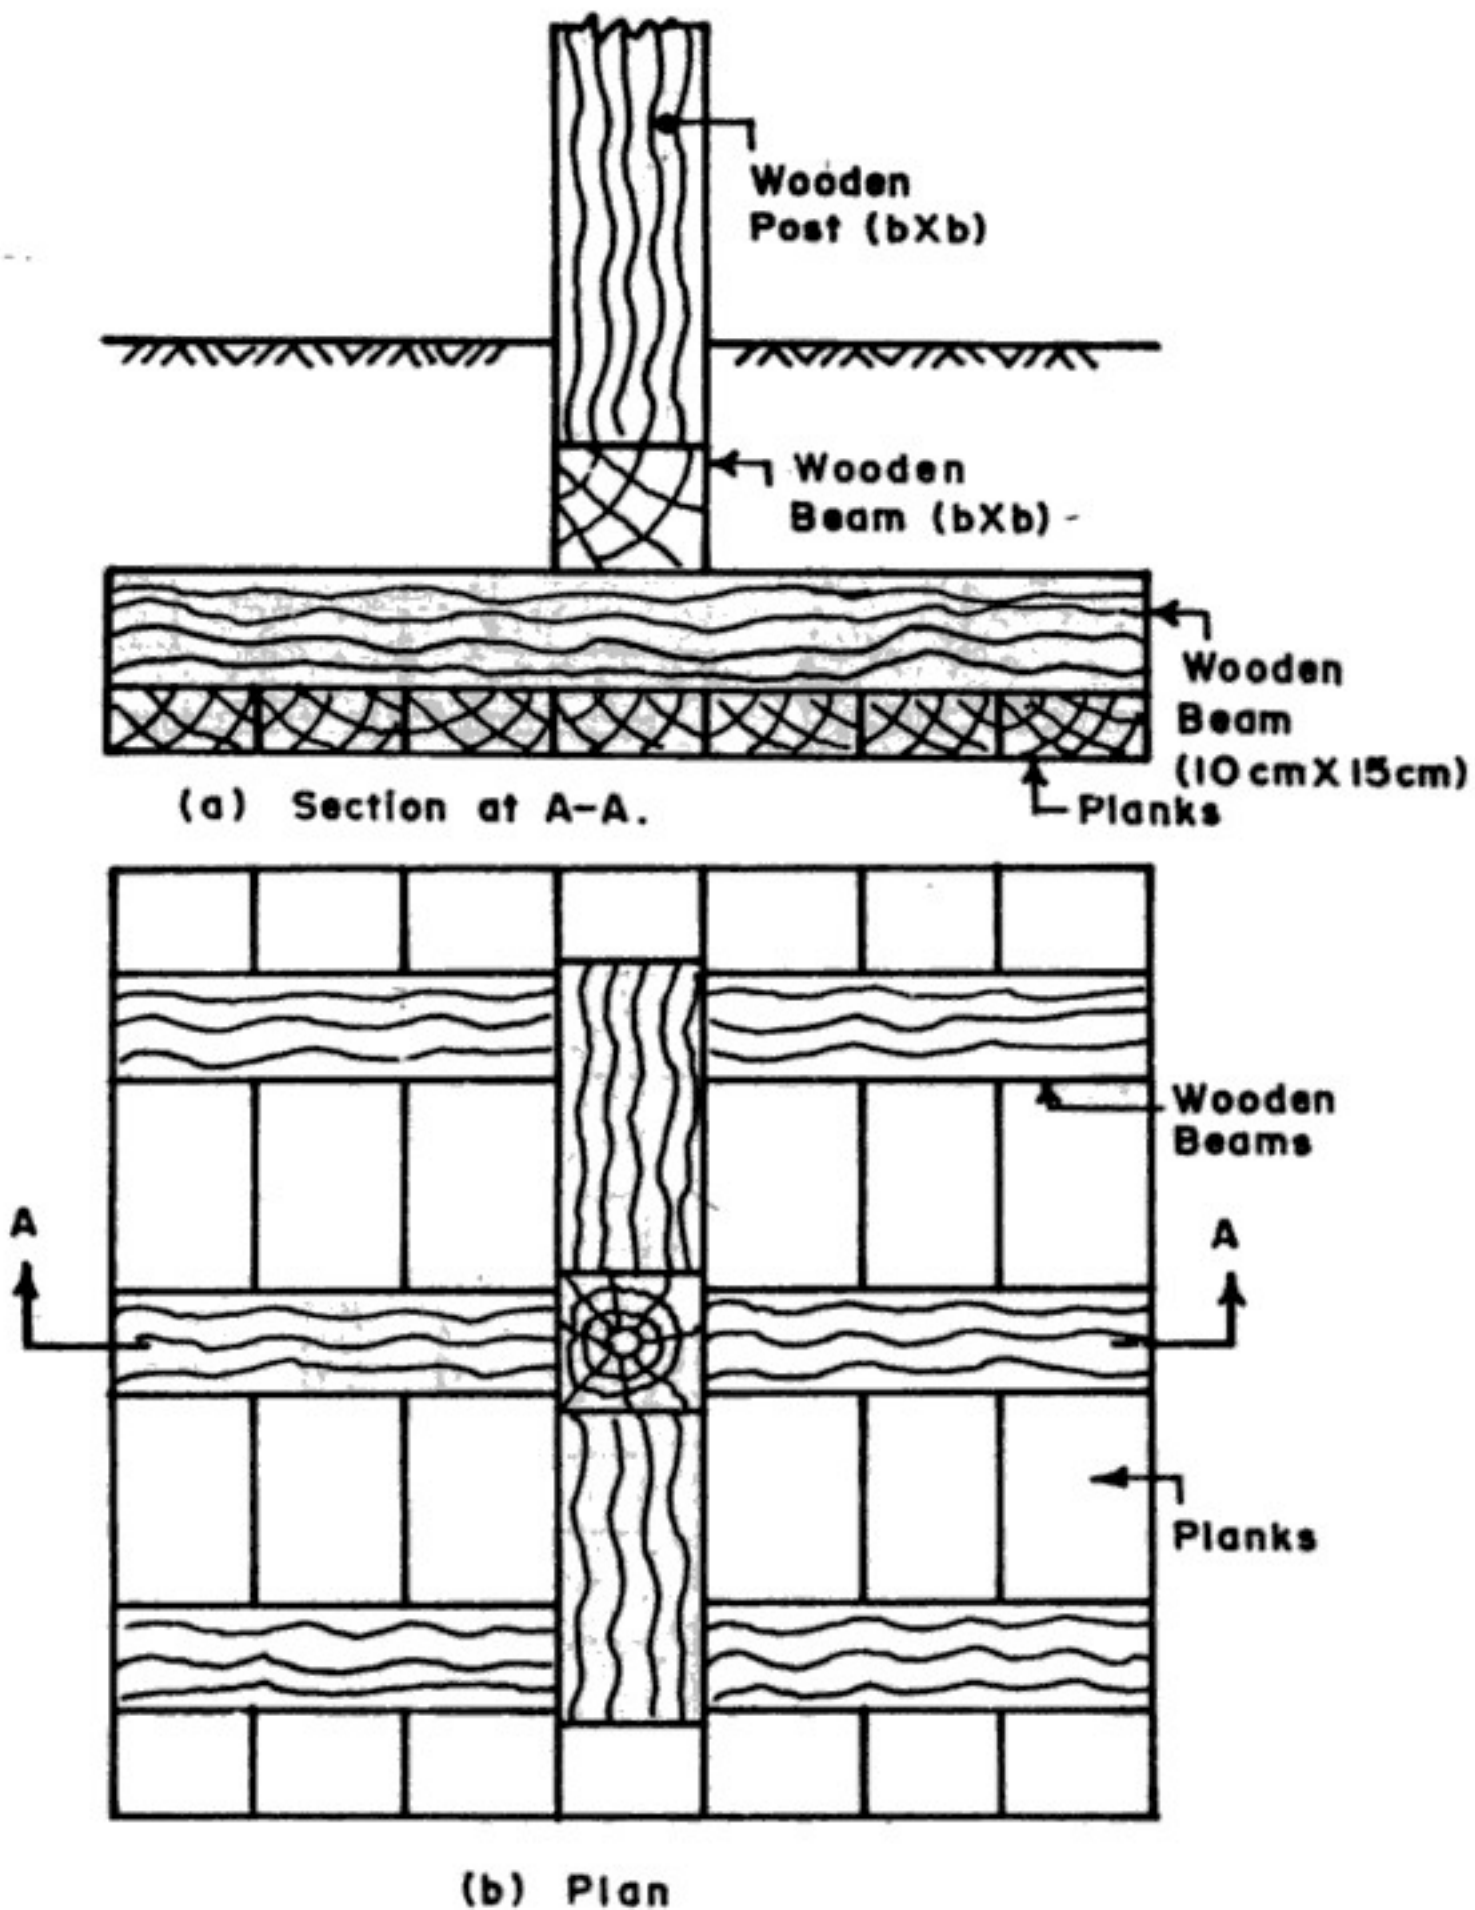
TIMBER GRILLAGE FOUNDATION FOR WOODEN POST.
